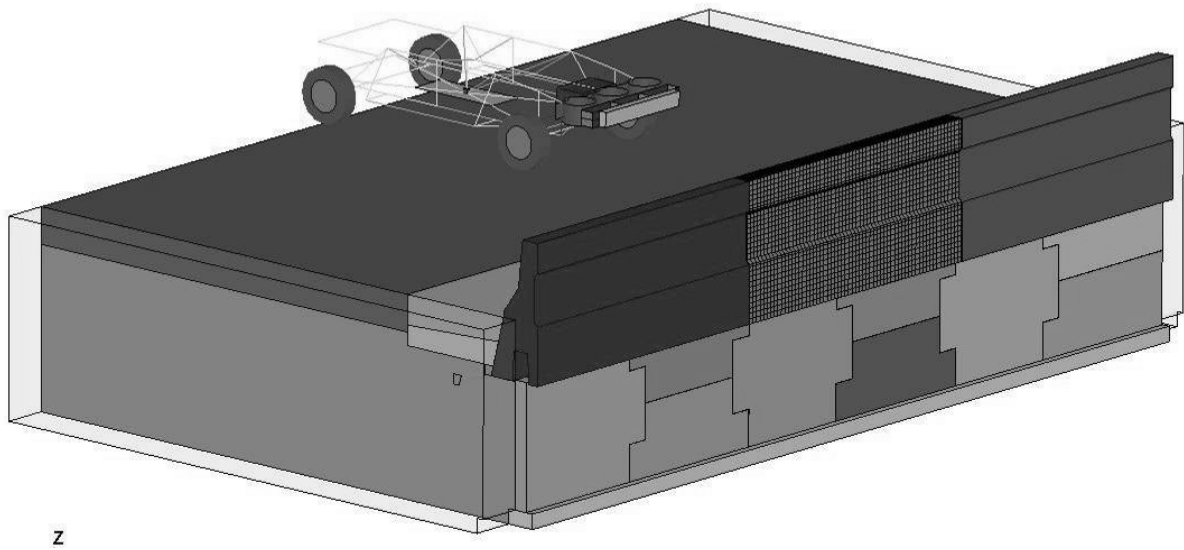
3D view of a MSE wall and barriers model with a bogie
